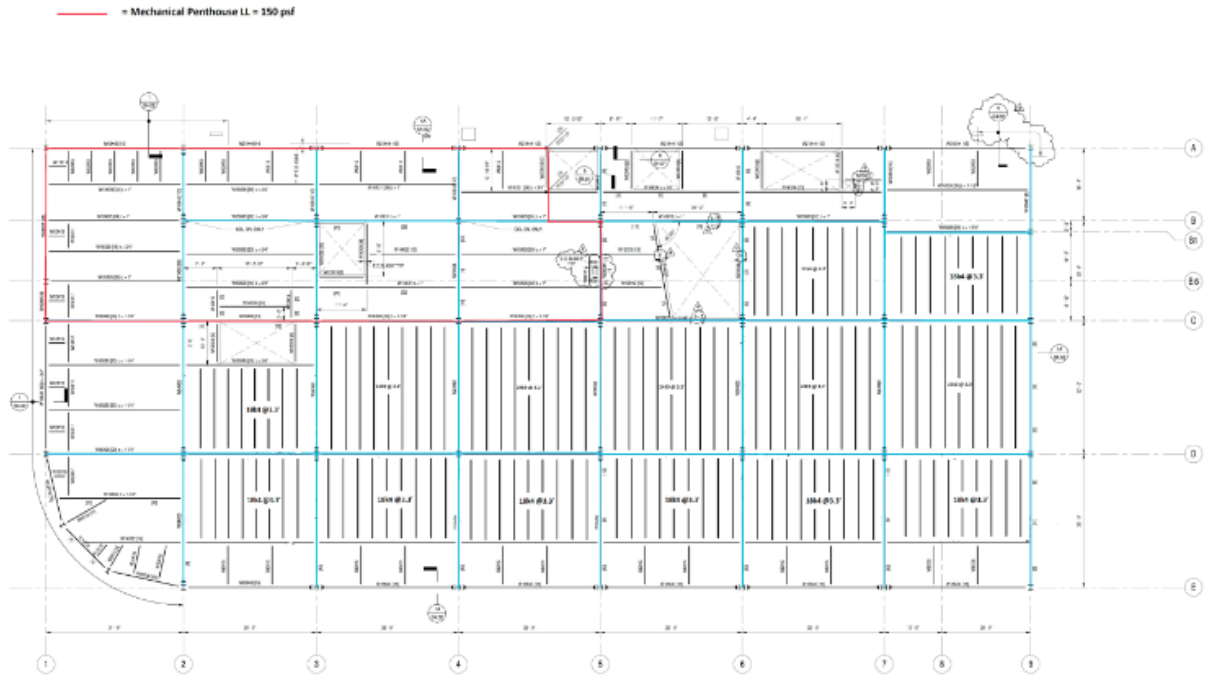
3rd Floor Layout of Open-Web Bar Joists
